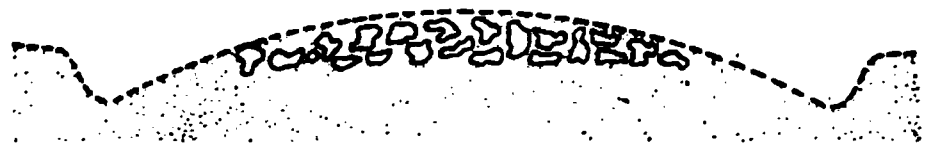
Cross-section of Road, showing lumps of clay placed on a sand subsoil and covered with sand.
